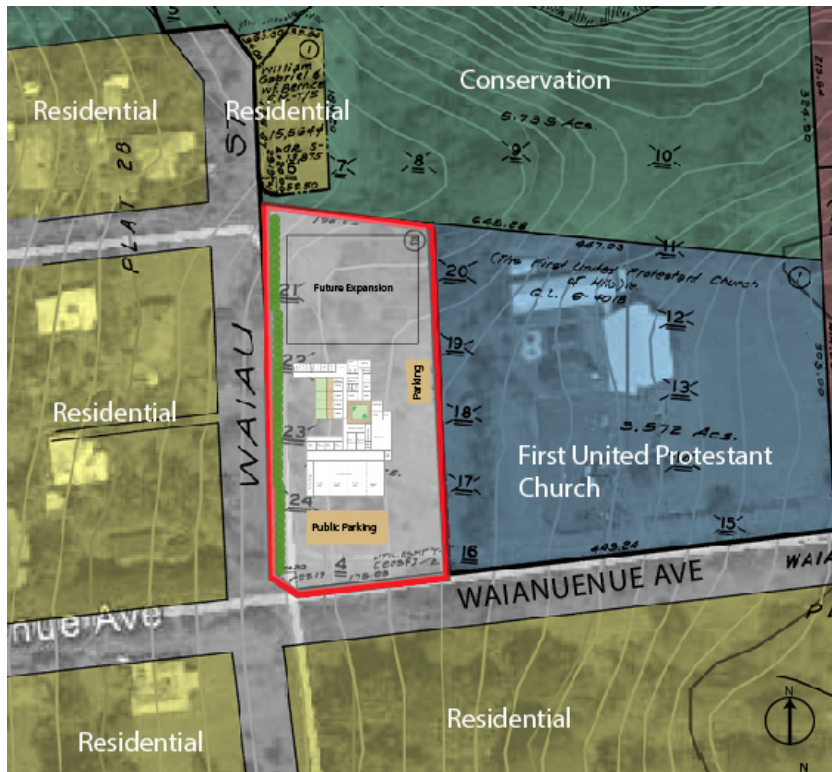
Proposed site with surrounding uses and early proposed building plan.
